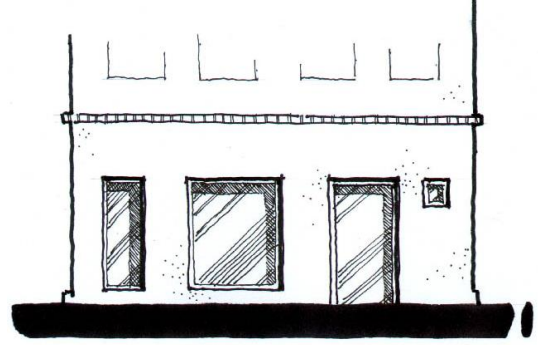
Ground level, street-facing facades shall have at least 50% clear glazing.
